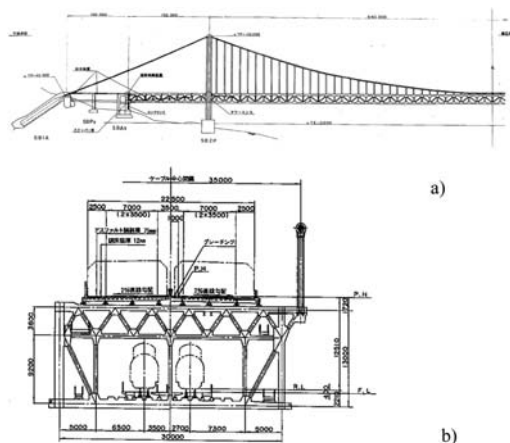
Main geometry of the bridge (a). Transversal section of the bridge deck (b).
